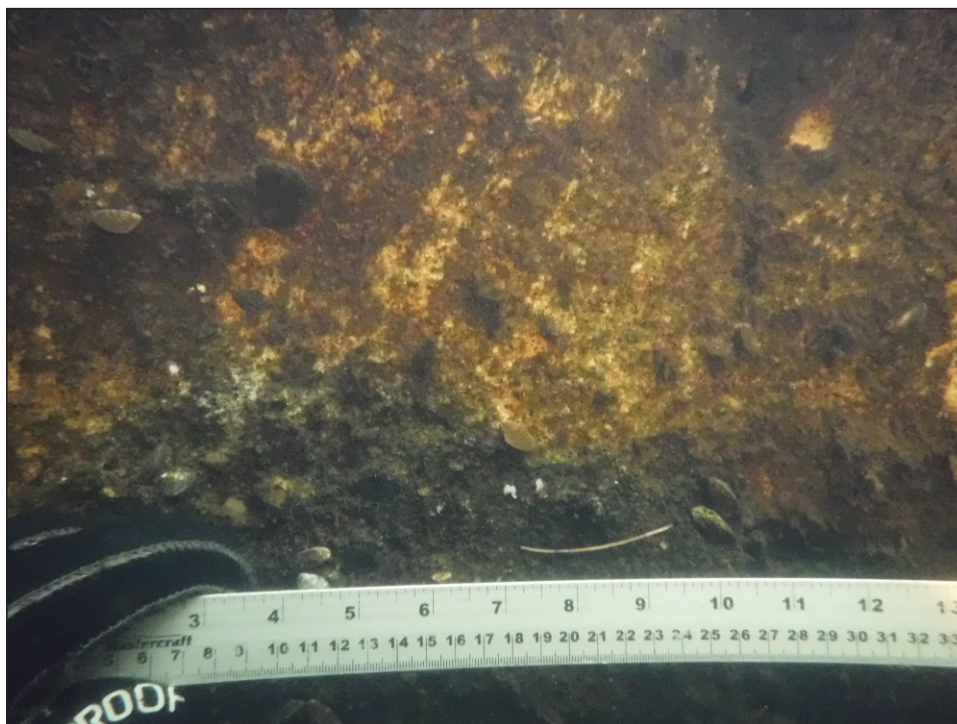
Spall on concrete blocks, west side of Rest Pier
